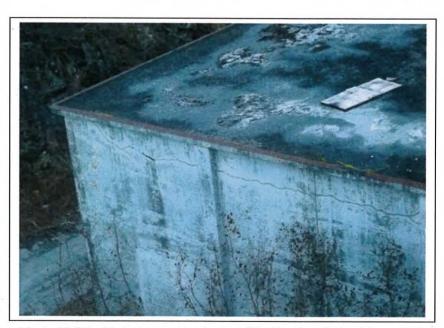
Exterior crack observed in Section B; looking south from fourth floor Section A. (October 22, 2014)
